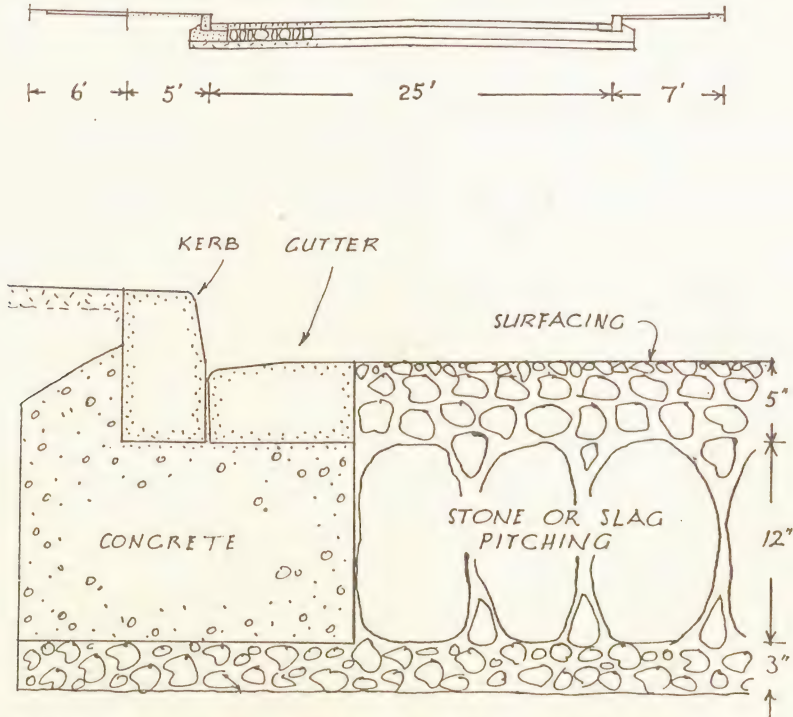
Cross section of road with stone or slag pitching and macadam surface.
